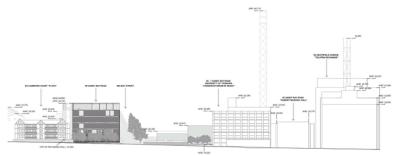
Architect's modelling of the proposed development in context with the Sandy Bay Road streetscape (Source: Room11 Architects).
